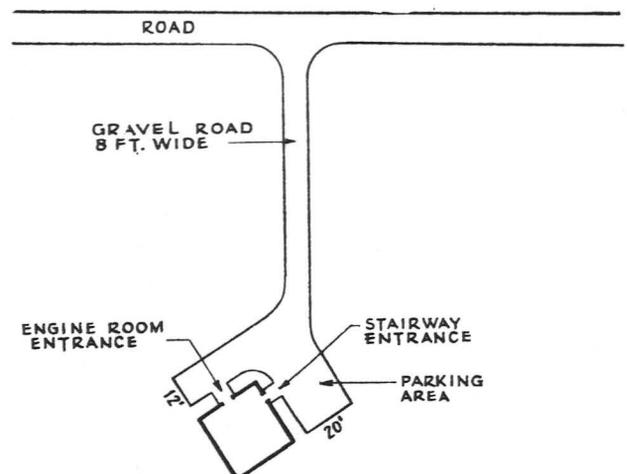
Typical Driveway Arrangement at a TD-2 Repeater Station
